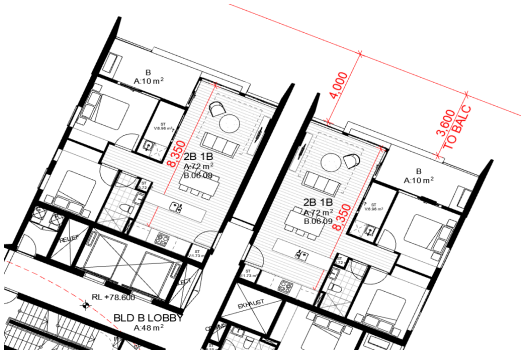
D2.1 Typical BLD B eastern tower's north corner apartments
